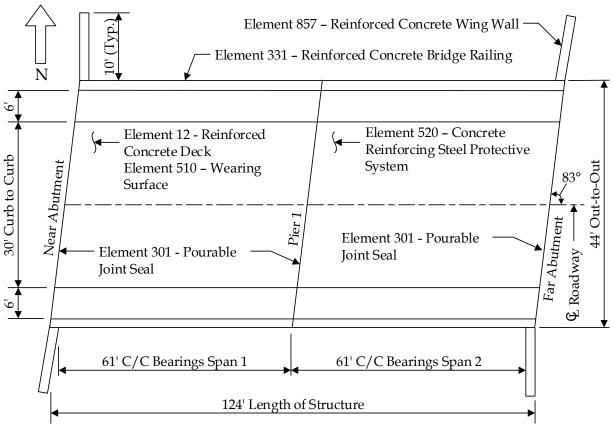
Plan View of Steel Multi-Beam Bridge
